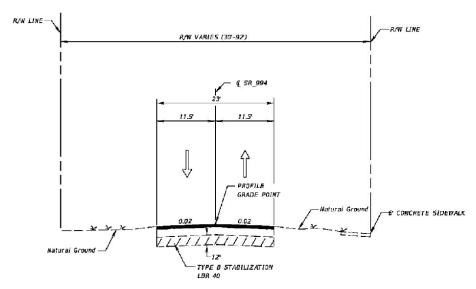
Existing Typical from SW 137th ST. to SW 127th ST.
